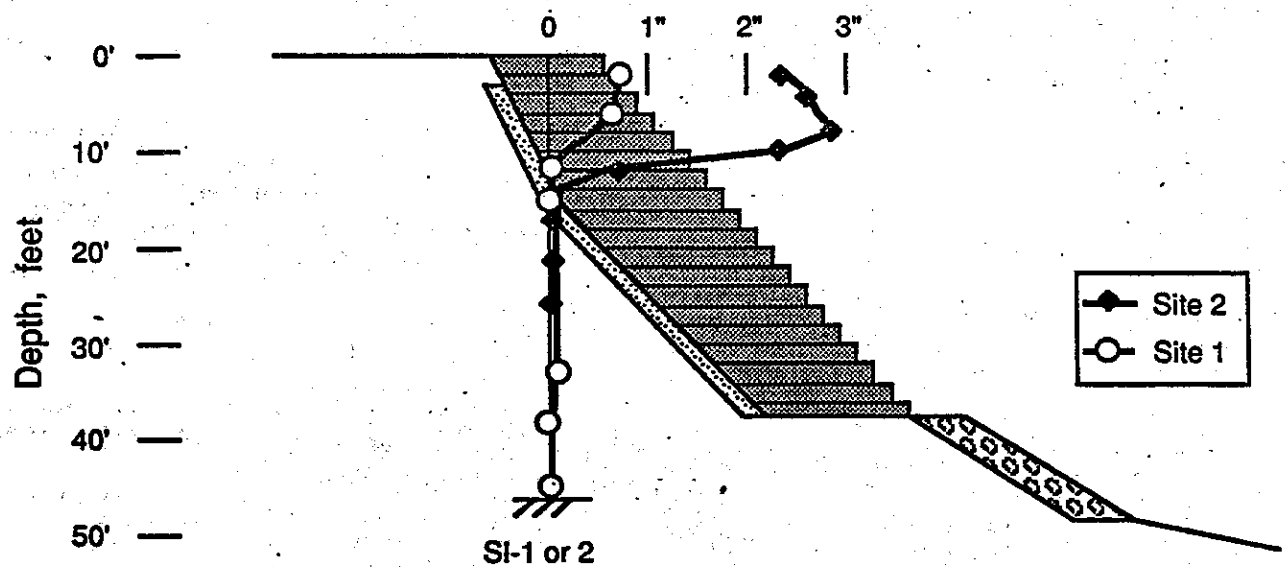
Cross Section of Tensar Reinforced Slope Showing Final Slope Indicator (SI) Deflection at Site 1 and Site 2.
